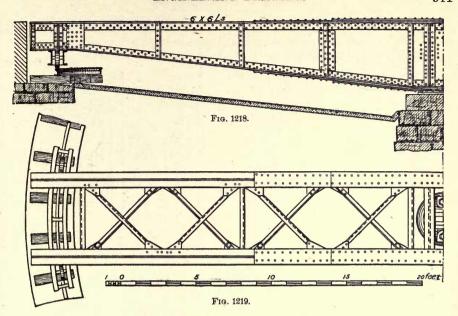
, 1219, and 1220 are elevation, plan, and detail of a turn-table as
